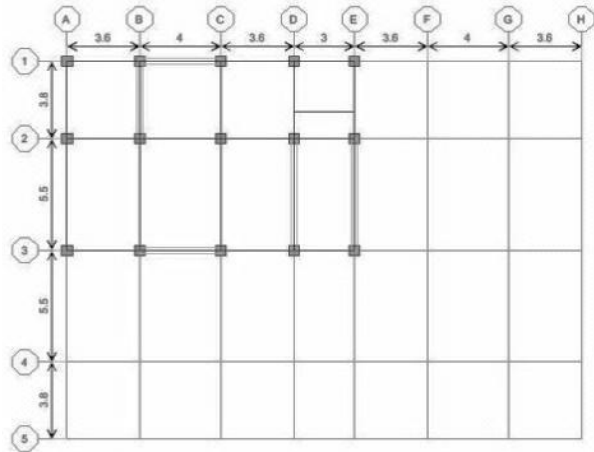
Seventeenth to twentieth Floor Plan (ST 17 to 20)
